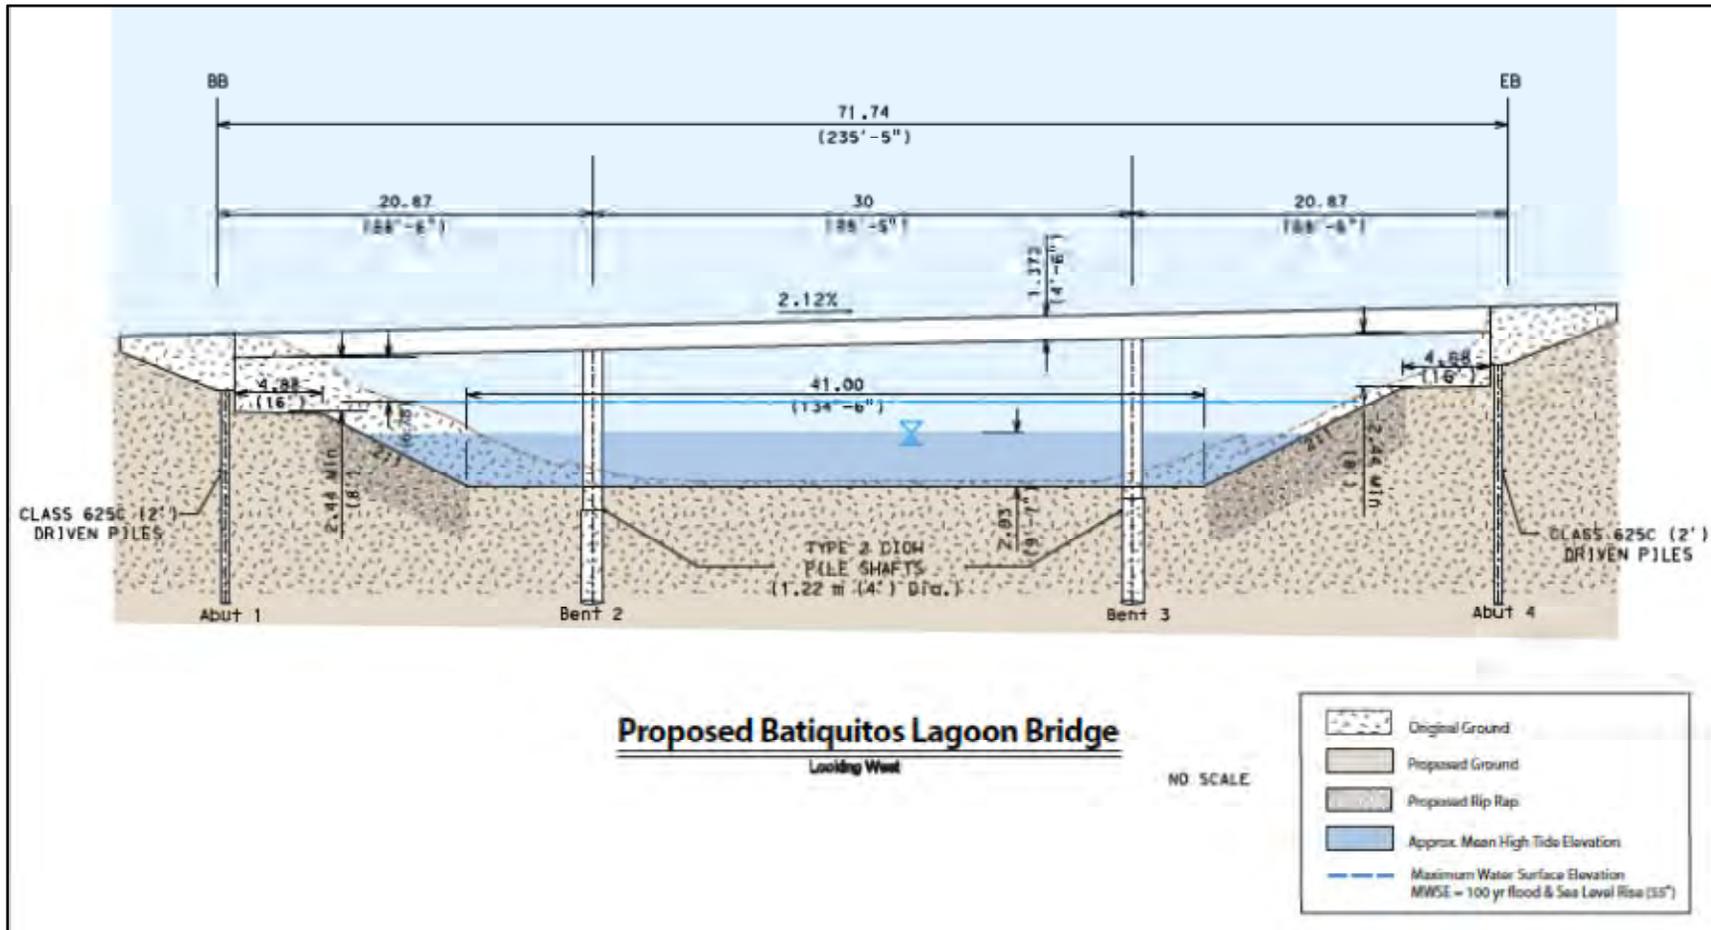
Proposed I-5 Bridge Exhibit (Looking from Lagoon to Ocean)
